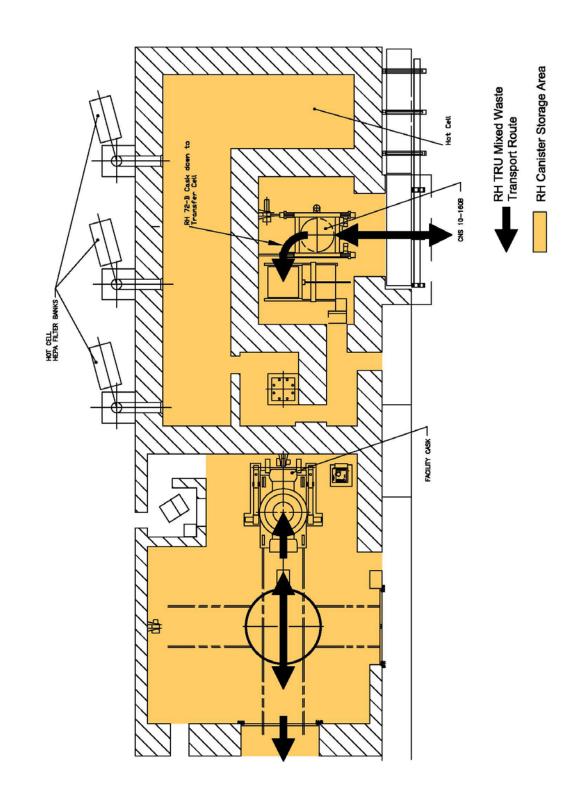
RH Facility Cask Loading Room and Cask Unloading Storage Area and Waste Transport Route
